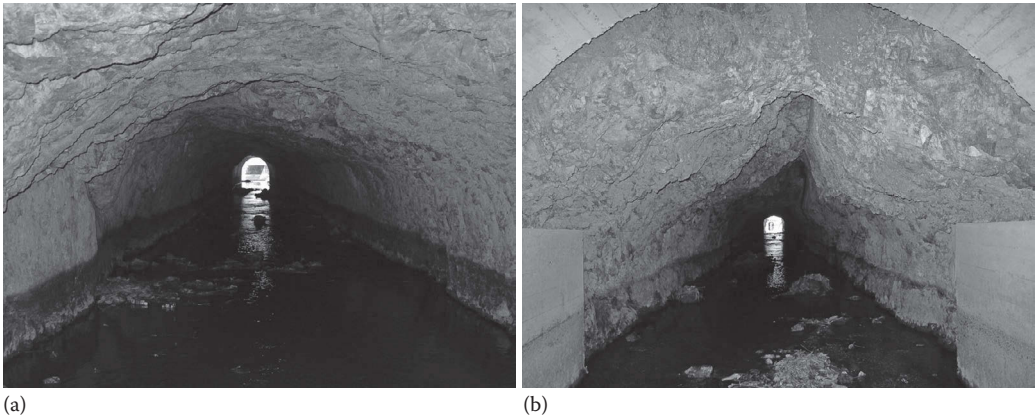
Kiri-yama Tunnel in Ako aqueduct: (a) Normal surface of the enlarged tunnel and (b) Excavated surface of a cave-in section shows a parallel wedge and a thin clay-filled fault.
